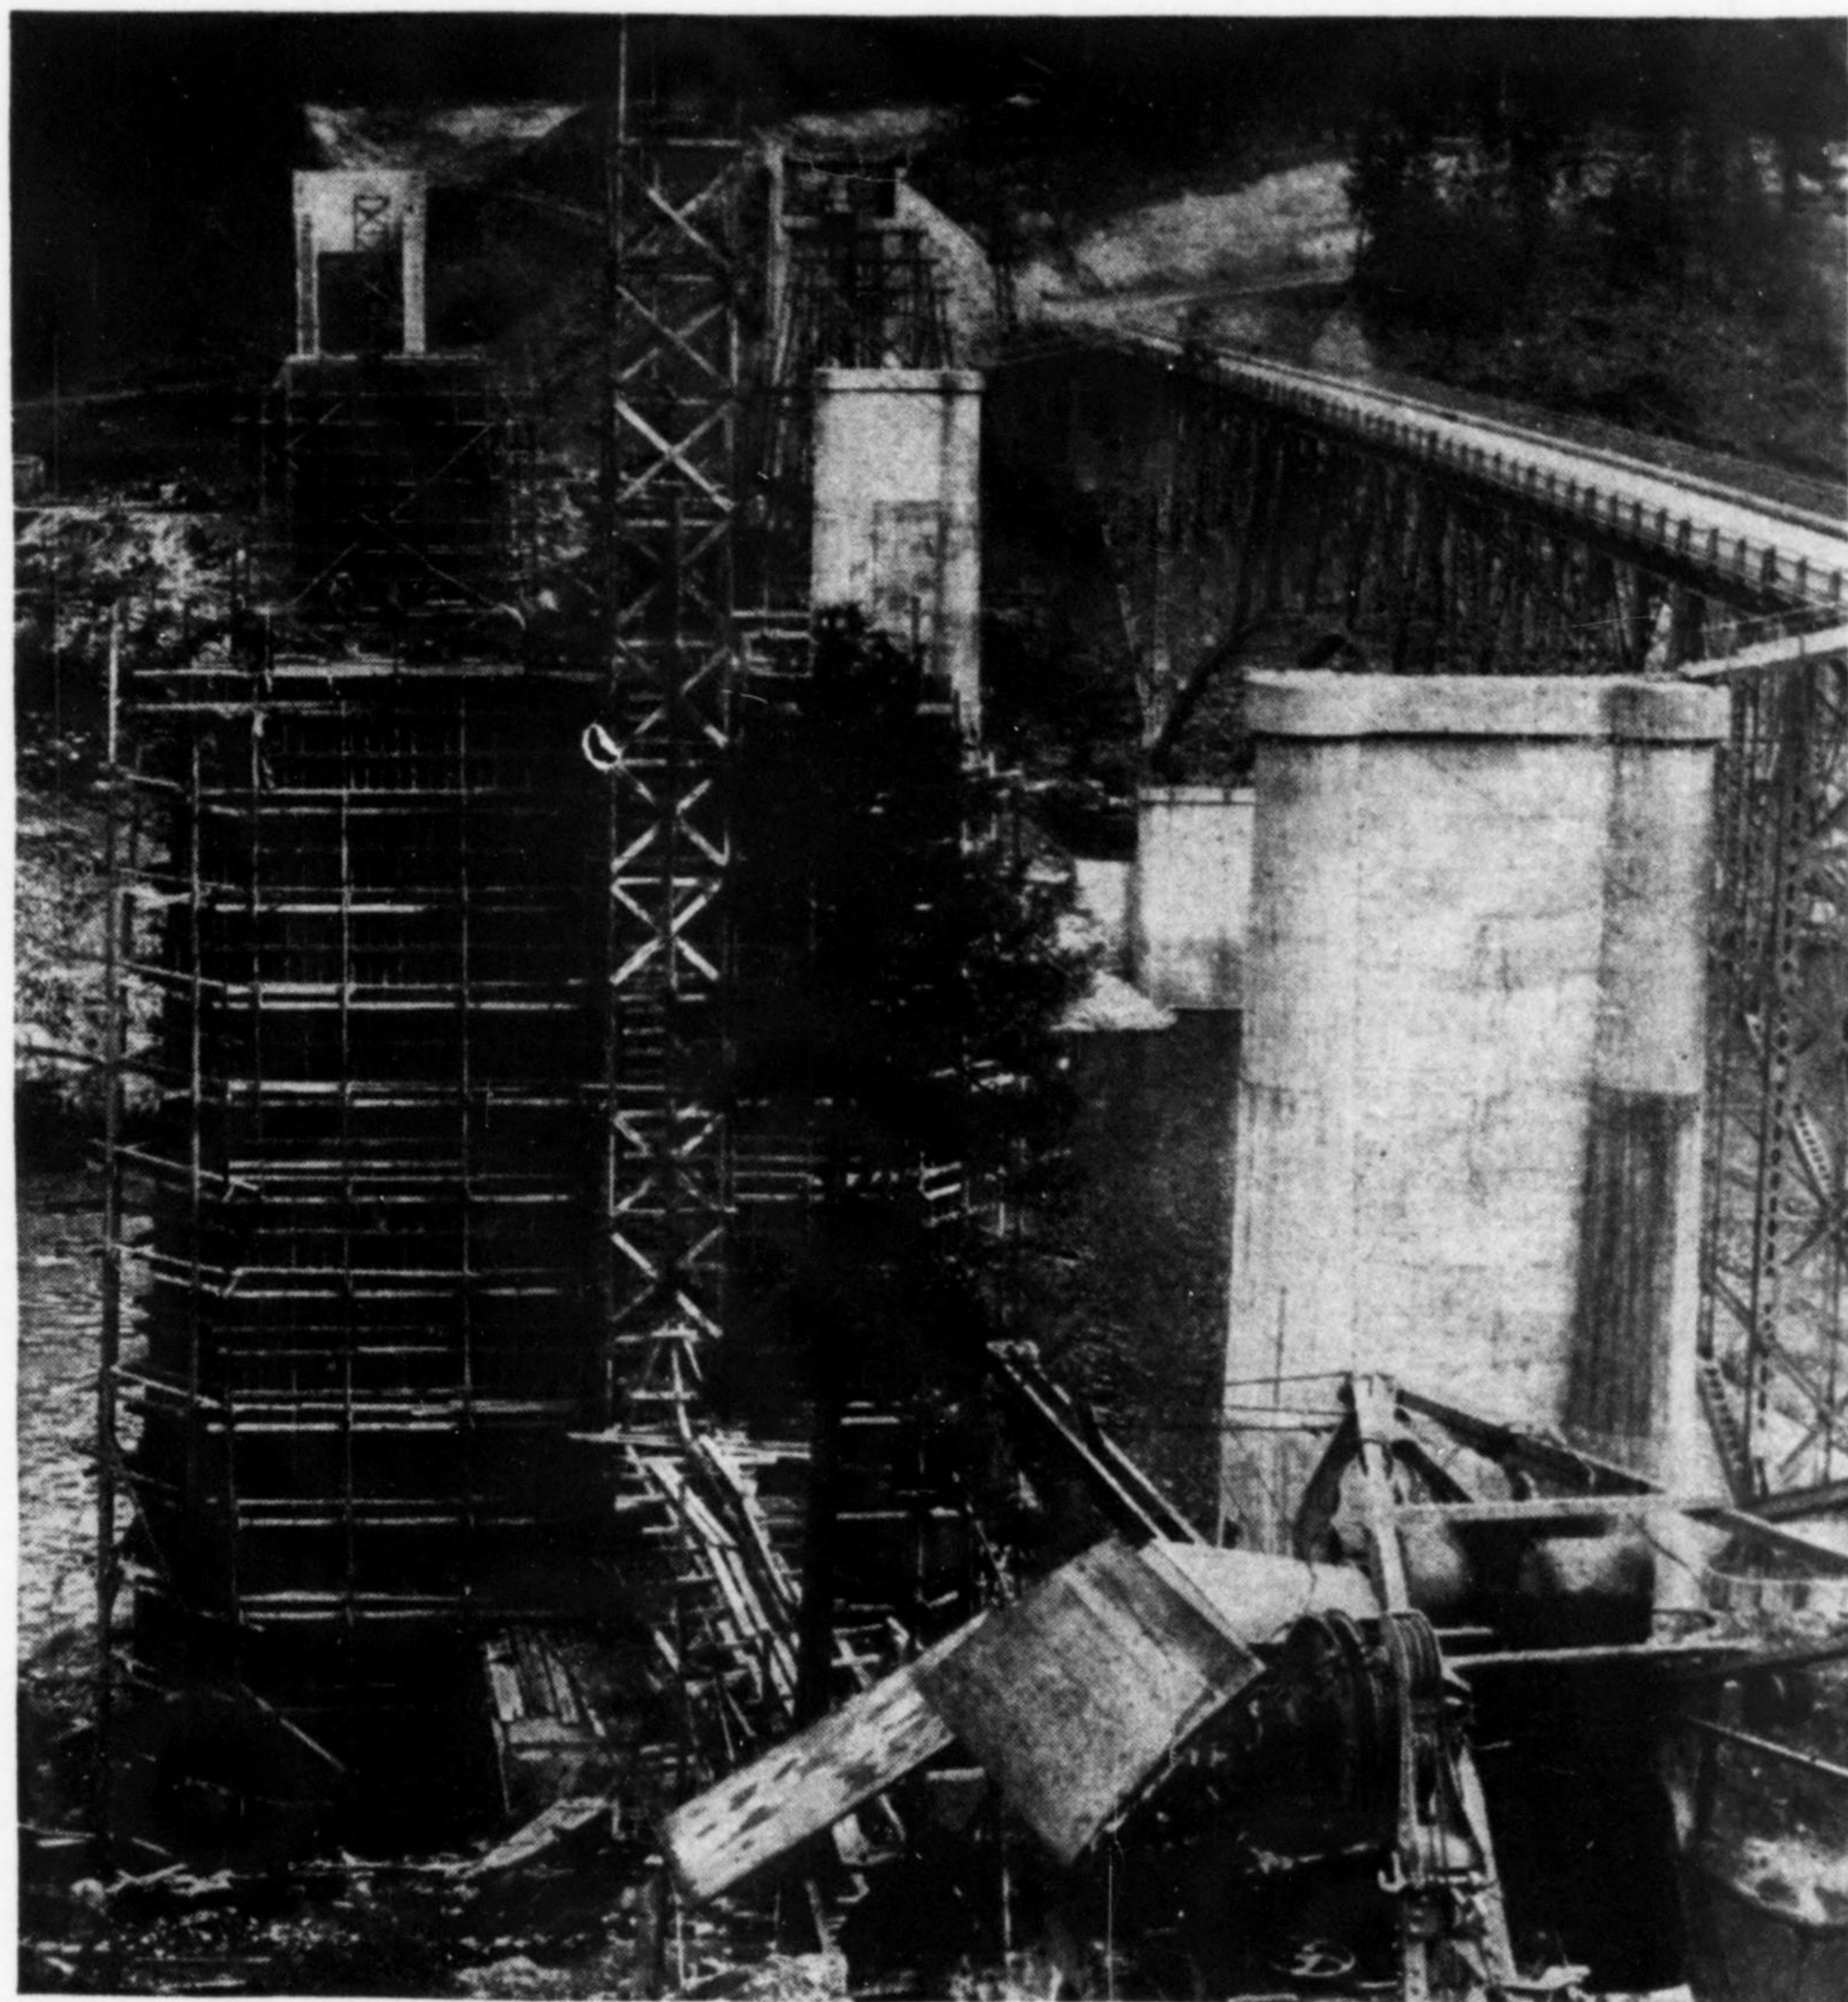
Old Kettle Falls highway bridge, which will be abandoned, is shown at right. Completed piers and abutments for the new highway crossing are in the center, while at left construction is in progress on railroad bridge piers.
